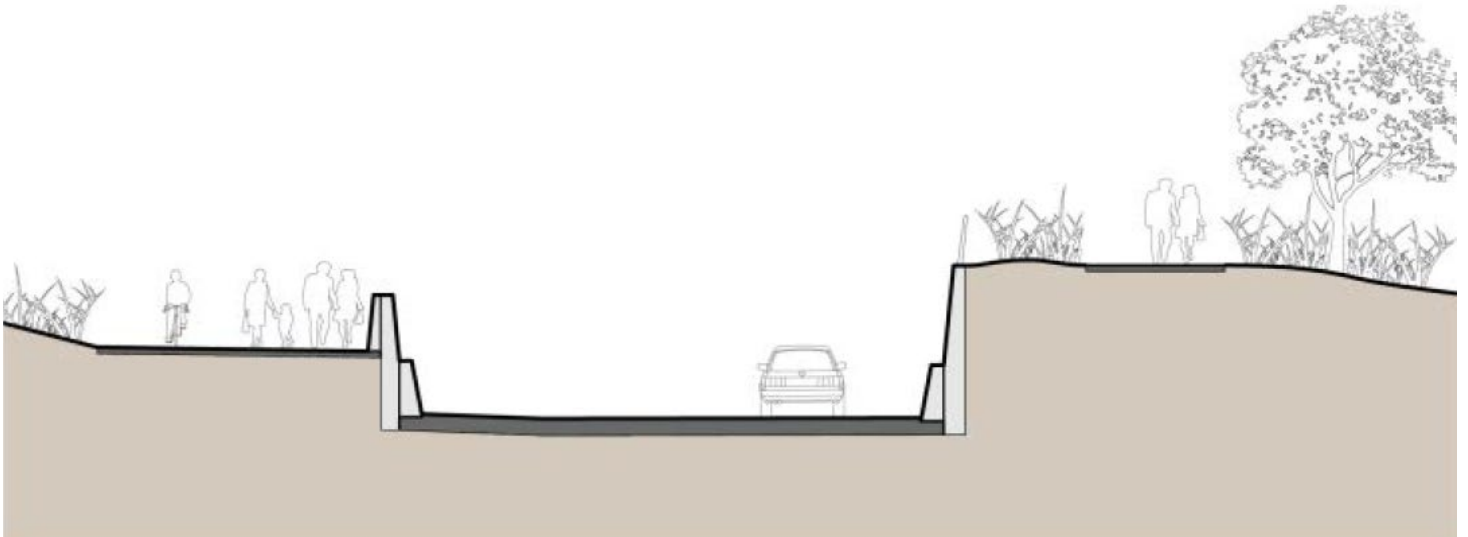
Section of west bound exit ramp onto Montlake Blvd
